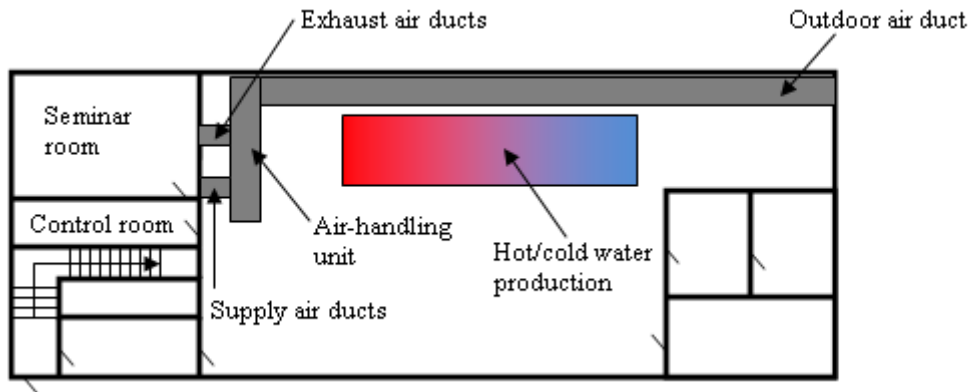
Layout of the test facility, including the seminar room, a control room and an open hall.
